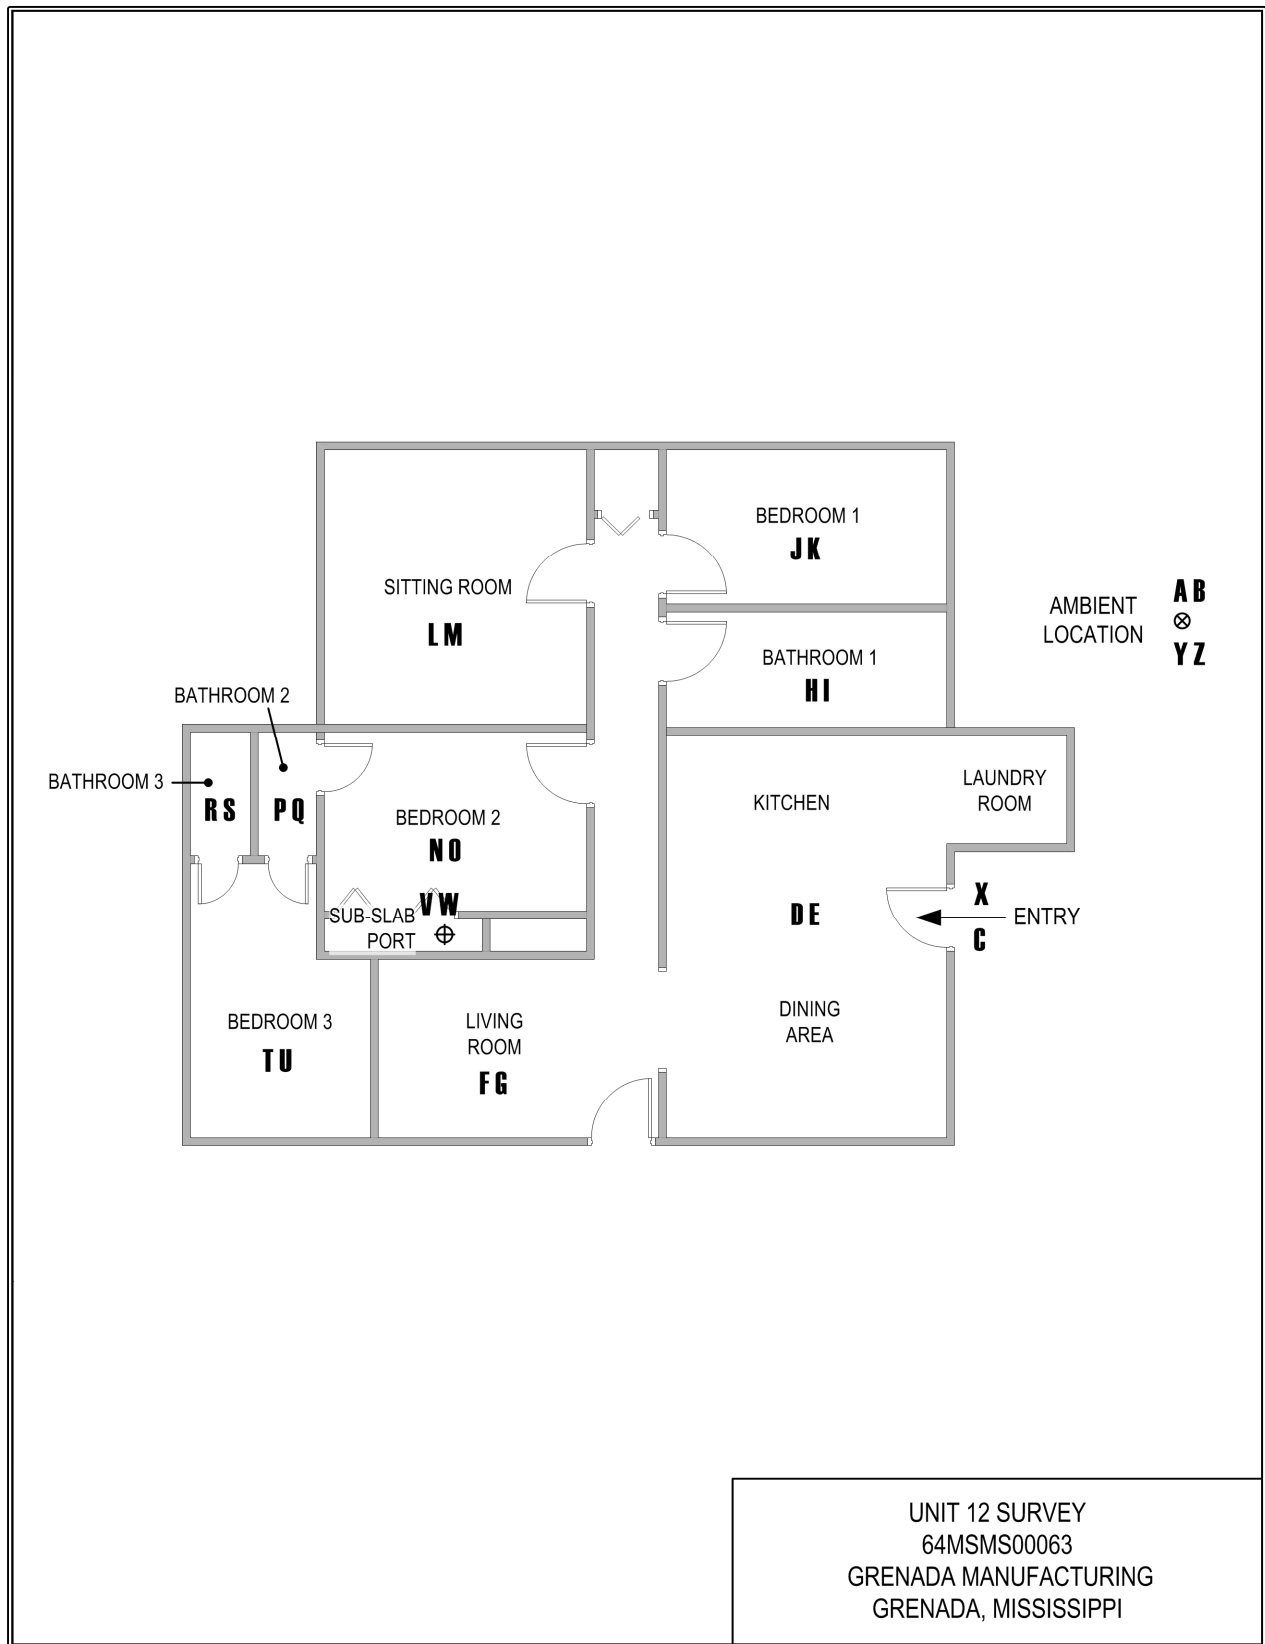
Unit 12 Survey Floor Plan, 64MSMS00063
